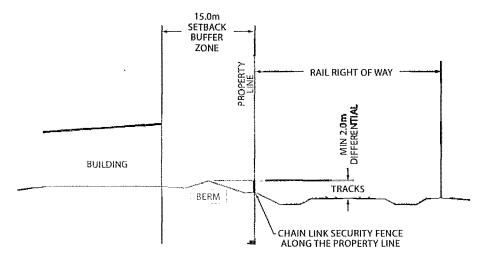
Commercial Building Setback / Buffering Adjacent to Railway
